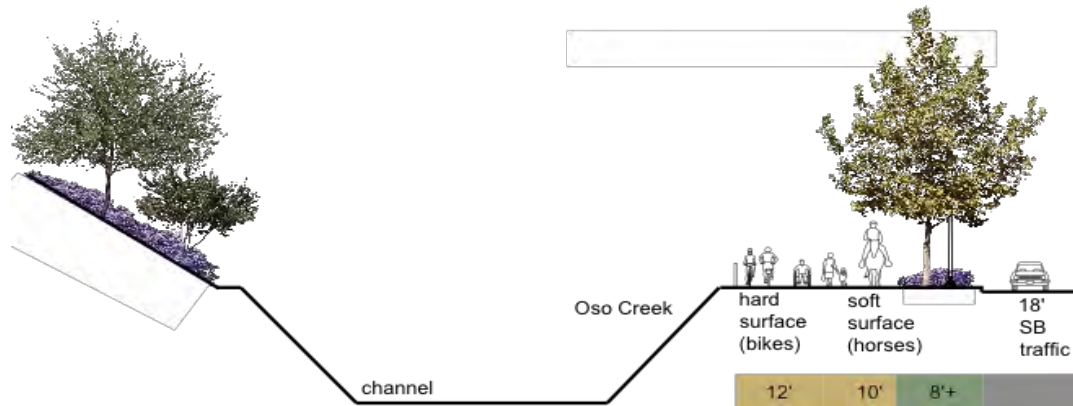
Typical Cross Section of Oso Creek and Forbes Road North
